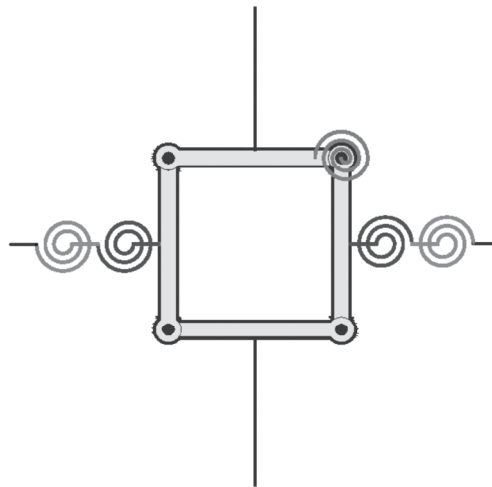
Beam-column joint model by Shin and LaFave (2004)
